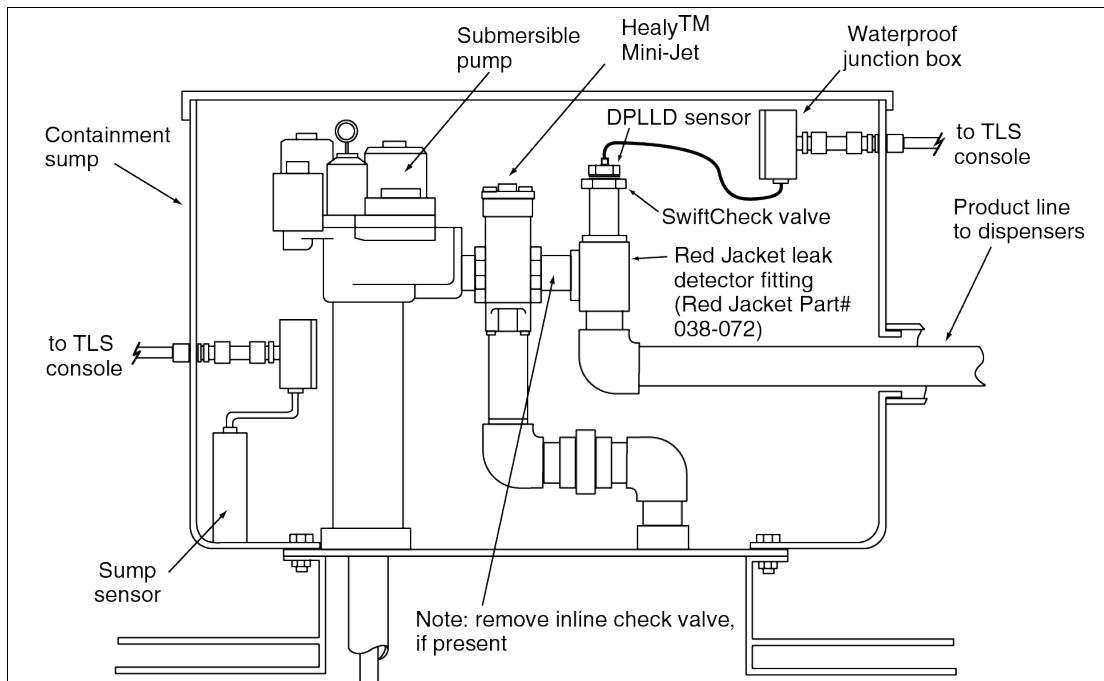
DPLLD Install W/Healy Mini-Jet System (Required Dielectric Union And Shutoff Valve Not Shown)
